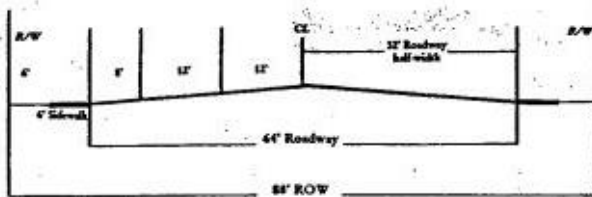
MARCH JPA GENERAL PLAN ROADWAY CROSS-SECTIONS
